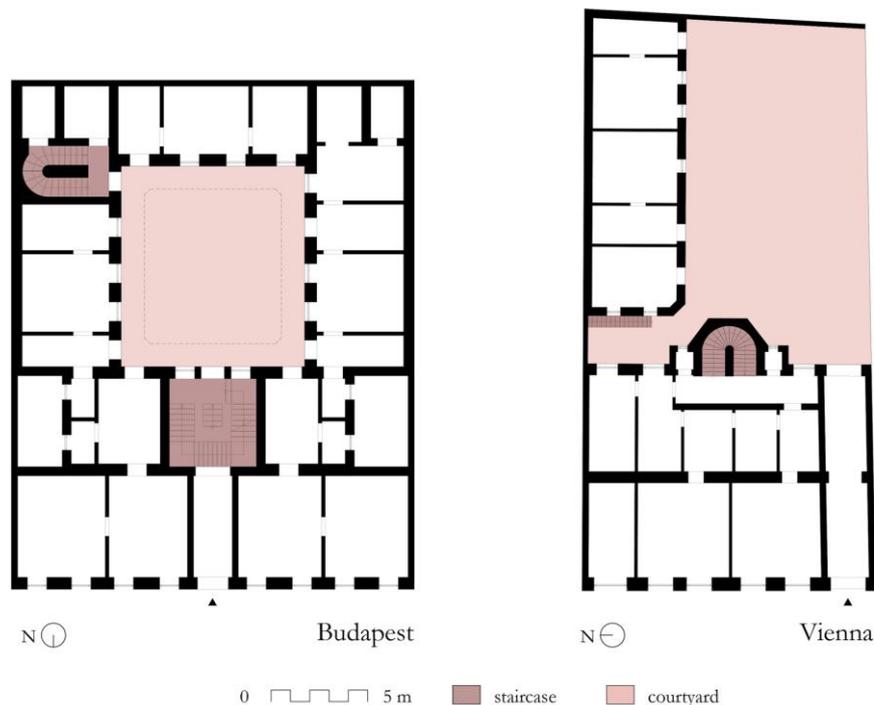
Schematic ground floor plans of the Gründerzeit building typologies
